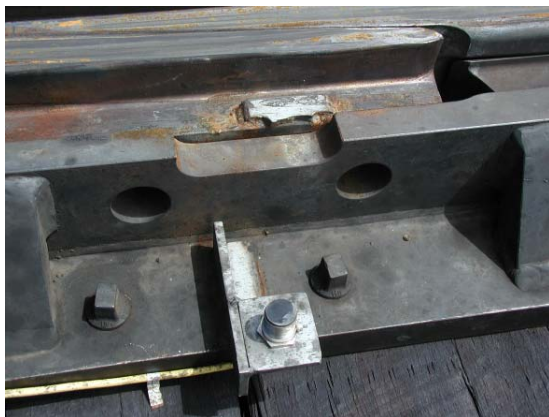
Broken Steel Target and Proximity Sensor, Welded to Miter Joint
